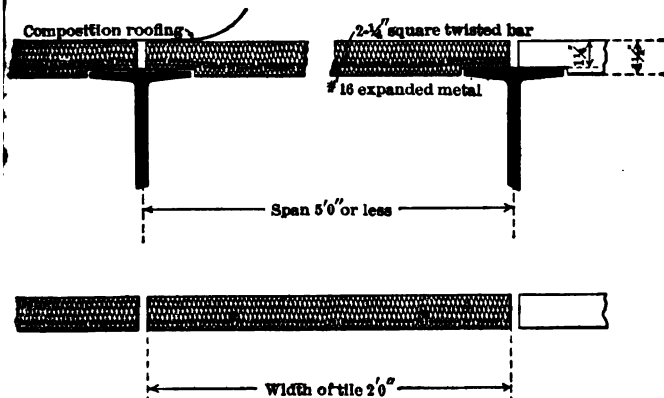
Bonanza Reinforced-cement Tiles for Flat Roofs
